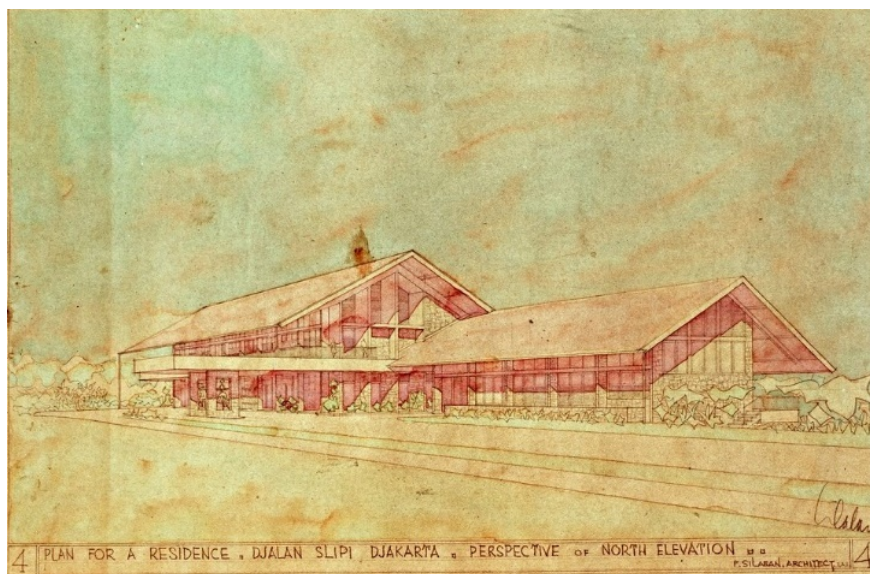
Wisma Yaso's second plan (1963-1964)⁷⁾
